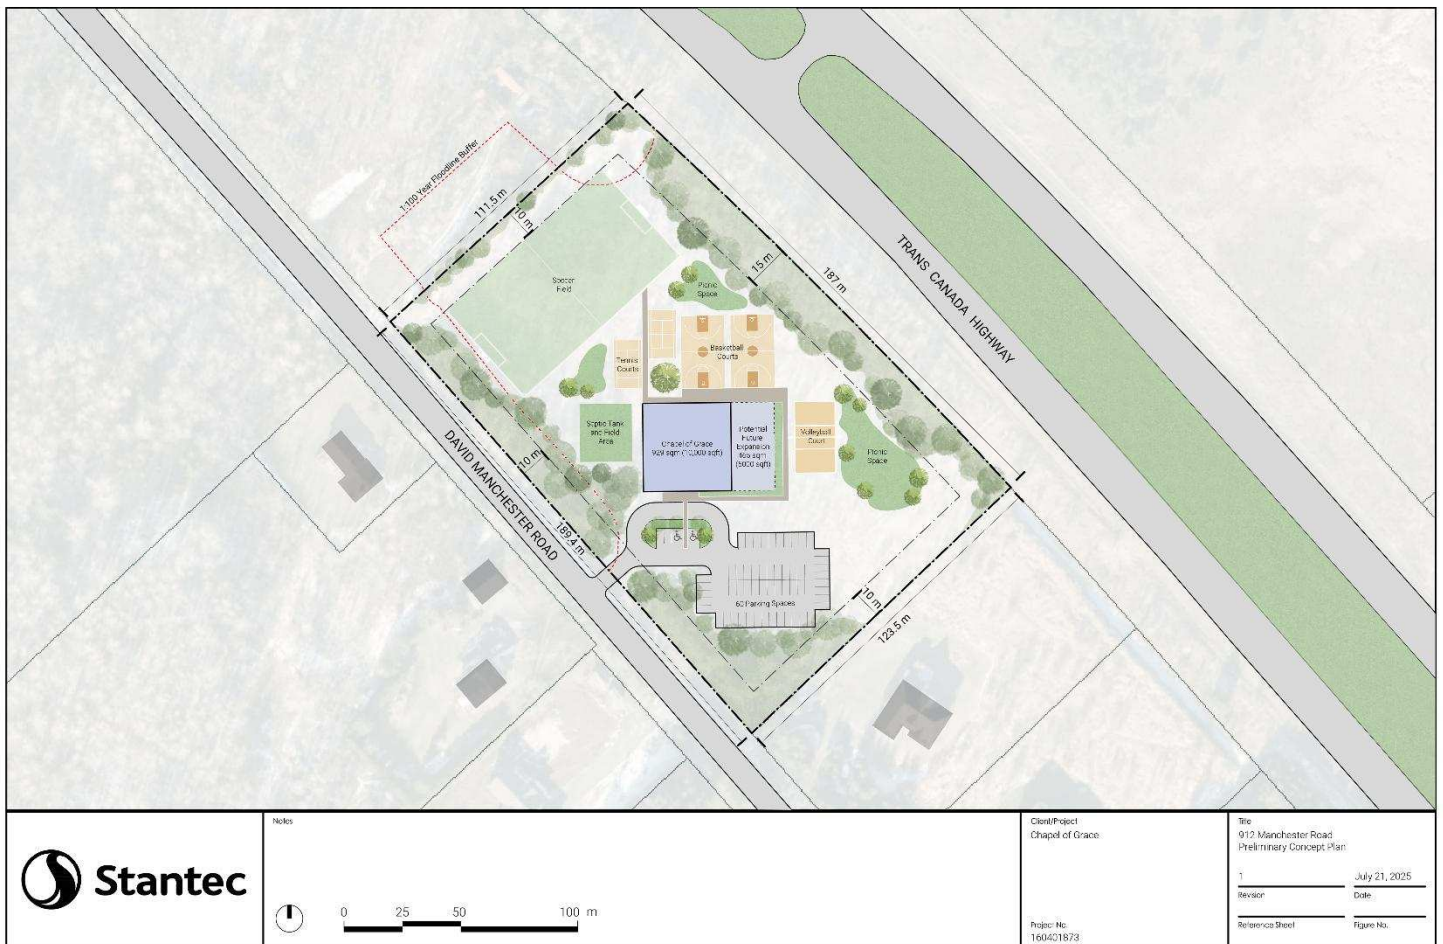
shows the Preliminary Concept Plan prepared by Stantec illustrating the proposed development.
